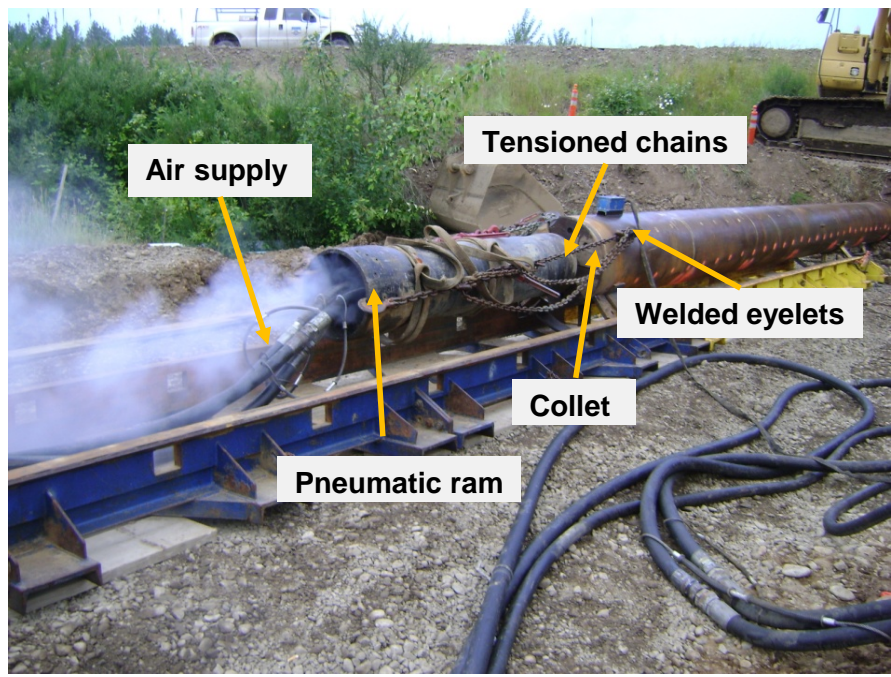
Typical pipe ramming setup; view from one of the study sites.
